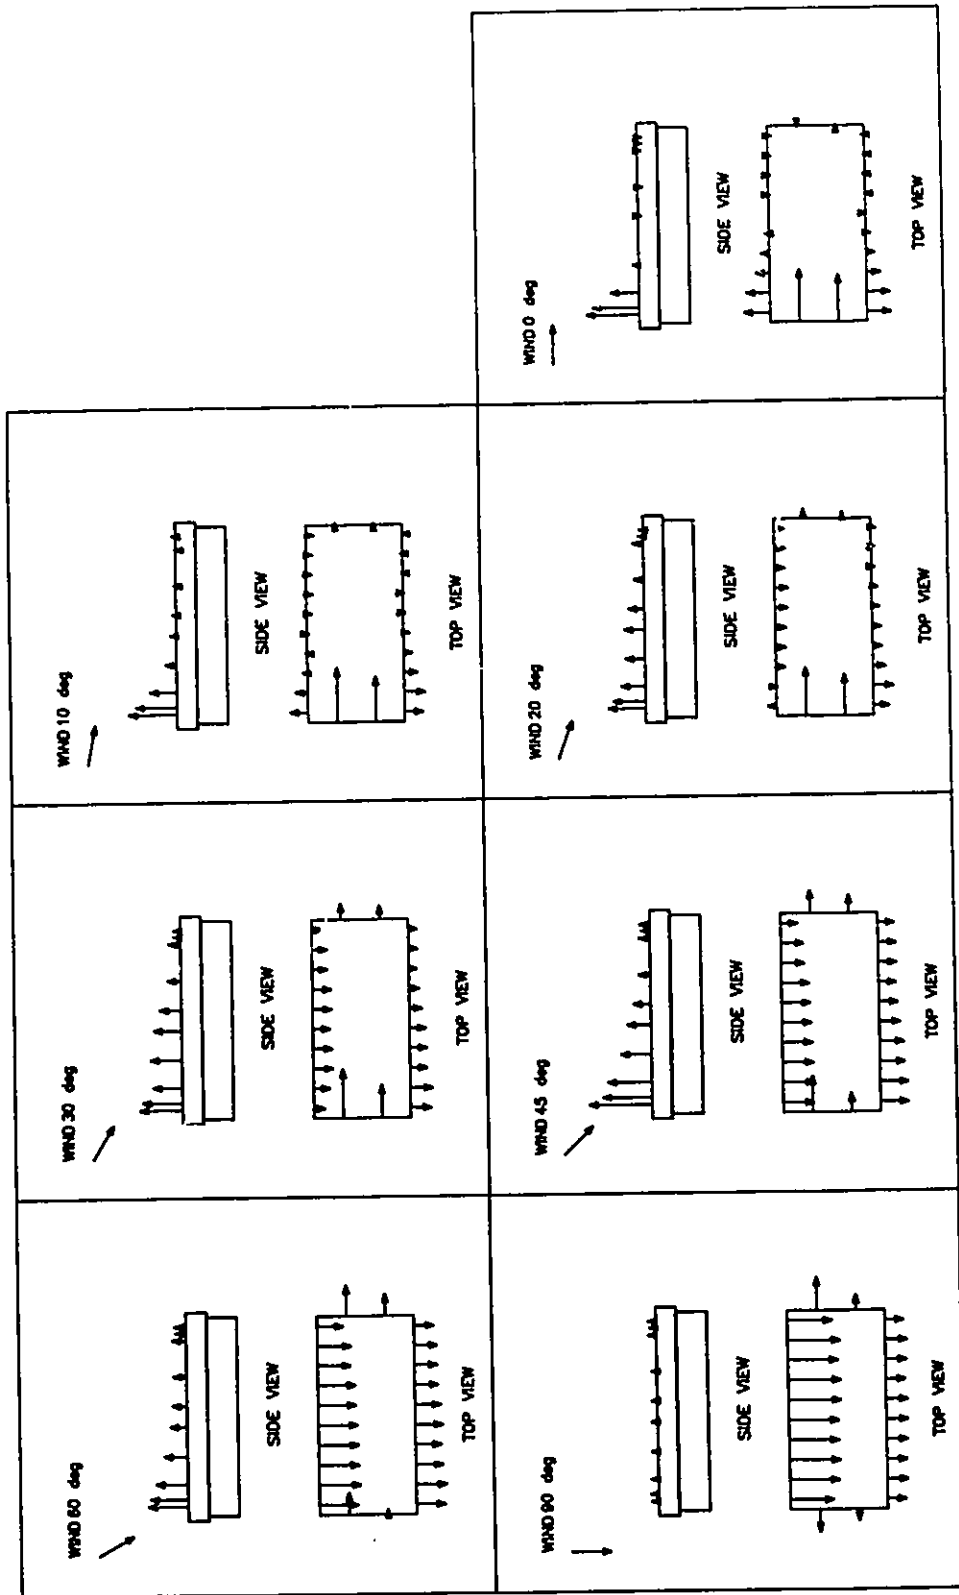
Δ Cps (in-out): open model, simulated 400 mm ridge and 1100 mm sidewall openings, open end walls, 7 wind angles of incidence. 417
